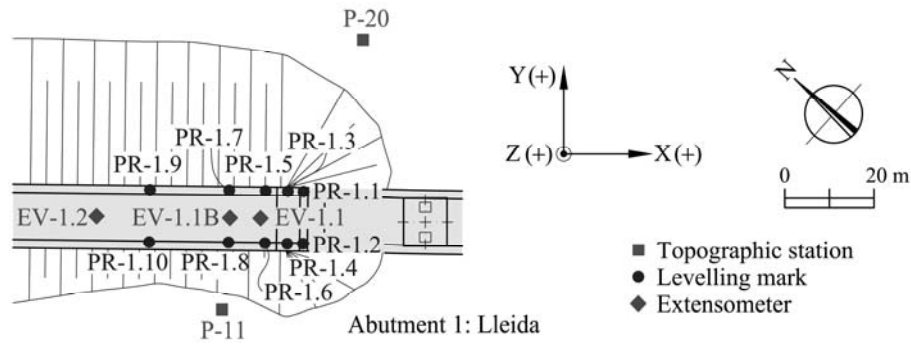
Position of surveying topographic stations, levelling marks and continuous extensometers in Lleida embankment
